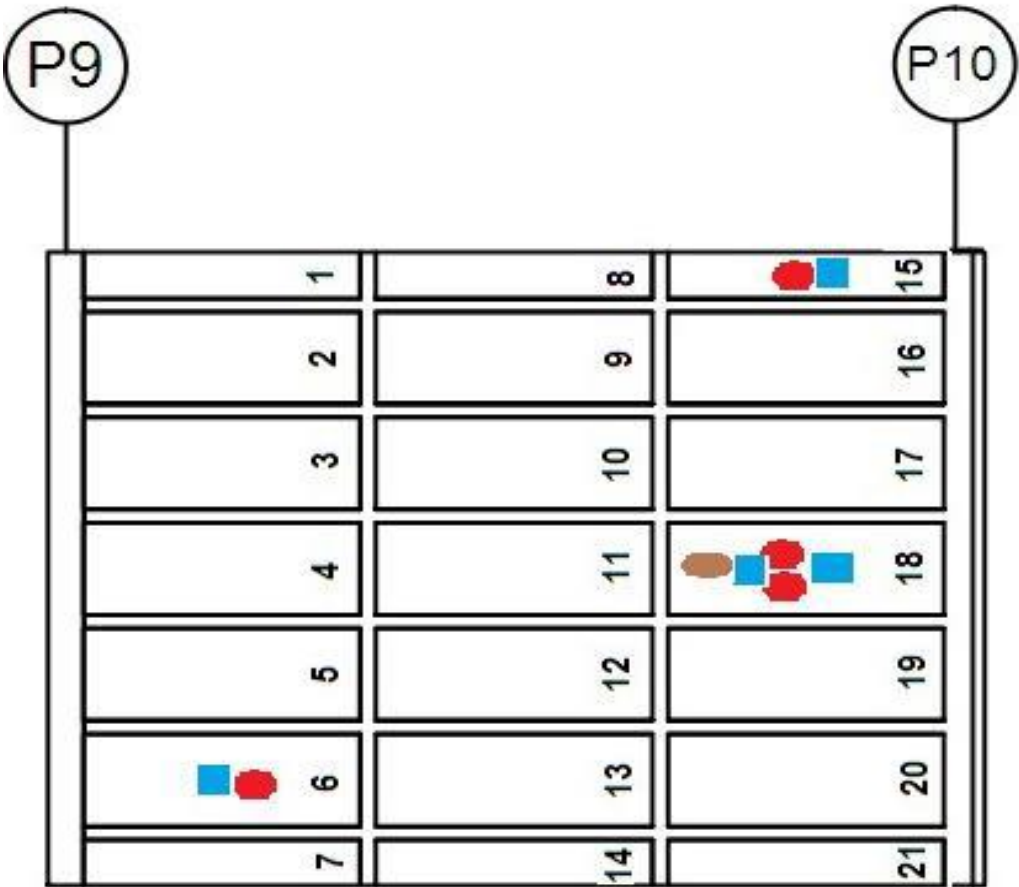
Test conducted at various locations between Pier P9 and Pier P10
